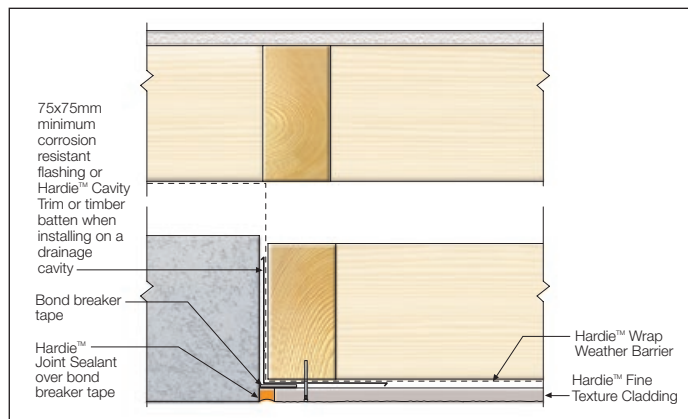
MASONRY (E.G. BRICK) ABUTMENT DETAIL
